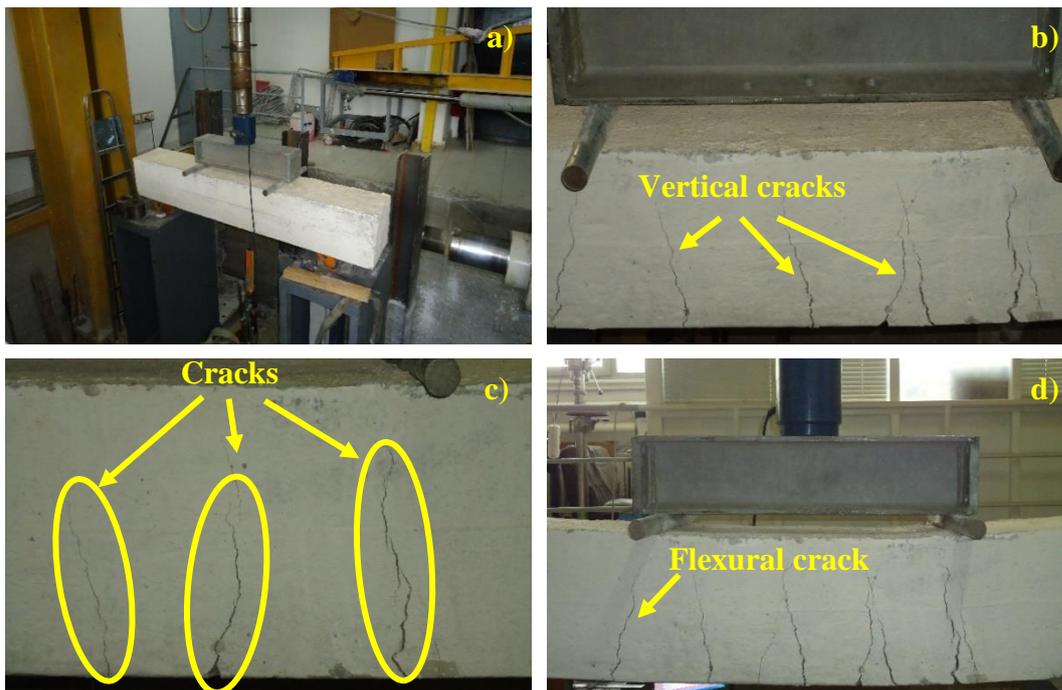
Crack and flexure behaviour of concrete beam with 75% bottom ash.
